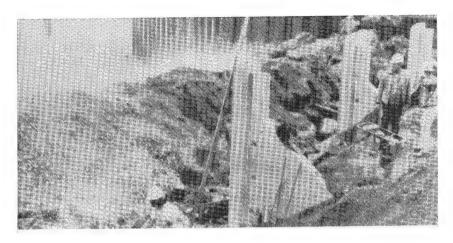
Precast tie-backs and panels used in seawall repair, California (from ASCE 1988)
